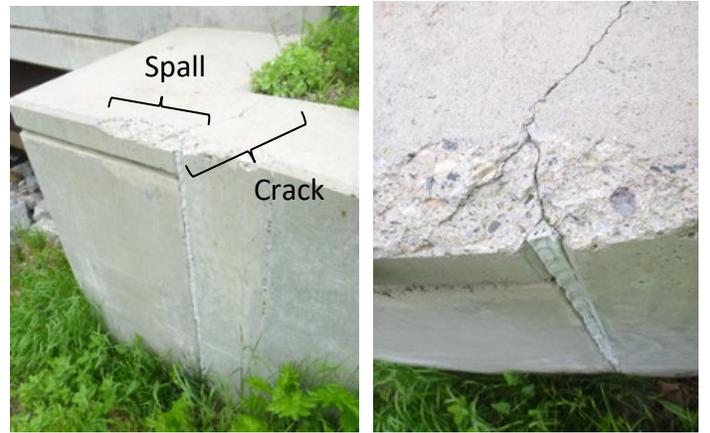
Typical Barrier Cracking at Jamaica Bridge
